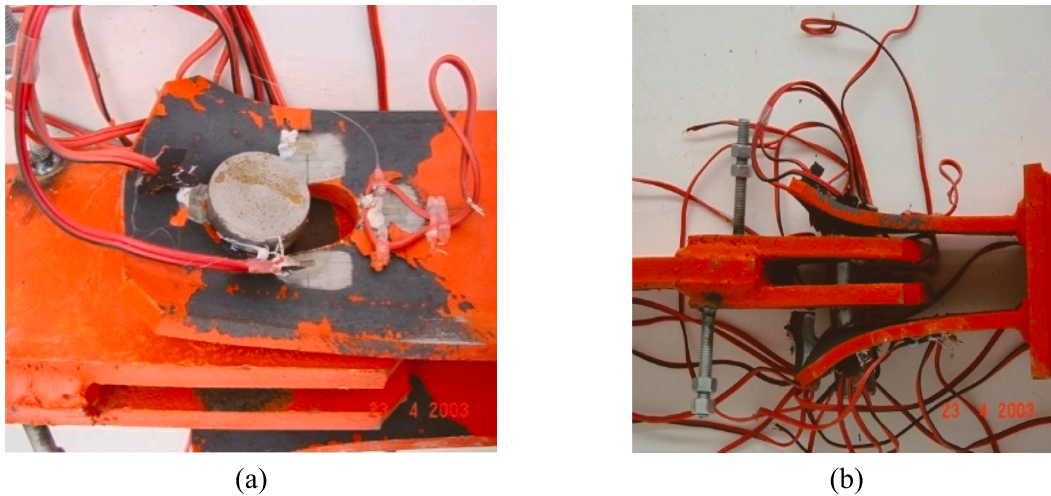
Prototype 1 with $\phi 36$ mm pin after failure: (a) plate bearing; (b) pin and plate bending.
